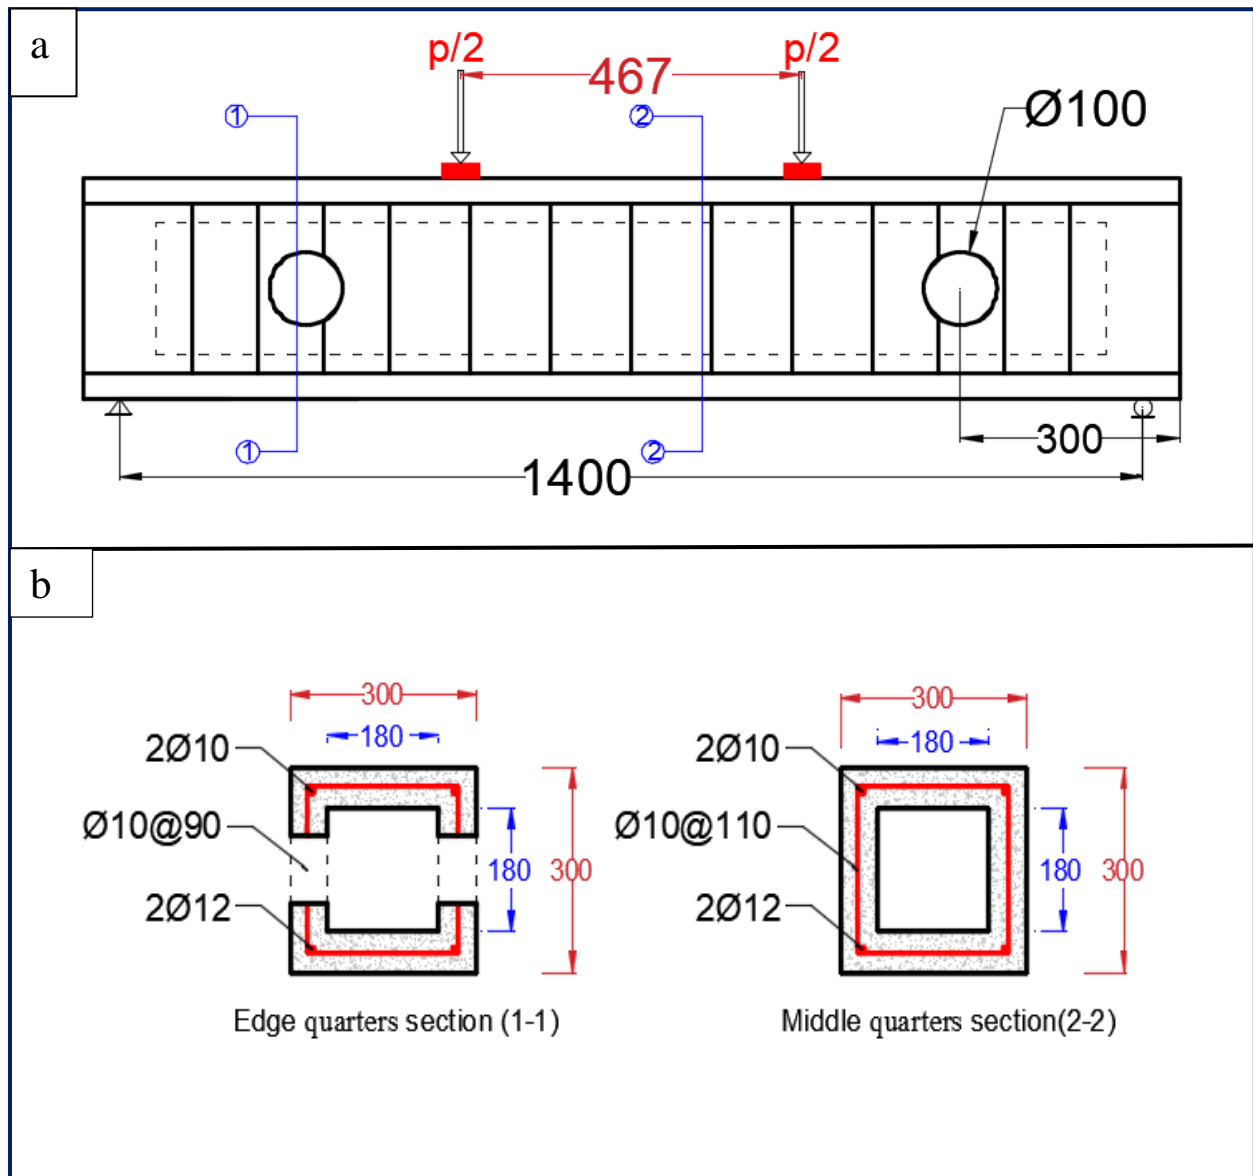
2: Reinforcement details for the beam H10SF (All dimensions in mm)
